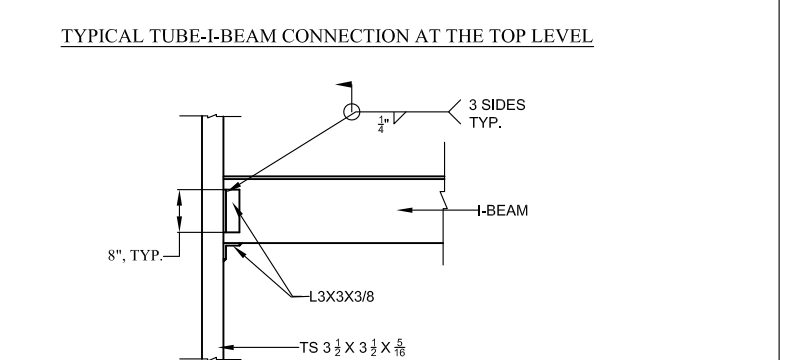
TYPICAL MOMENT BEAM TO COLUMN CONNECTION
